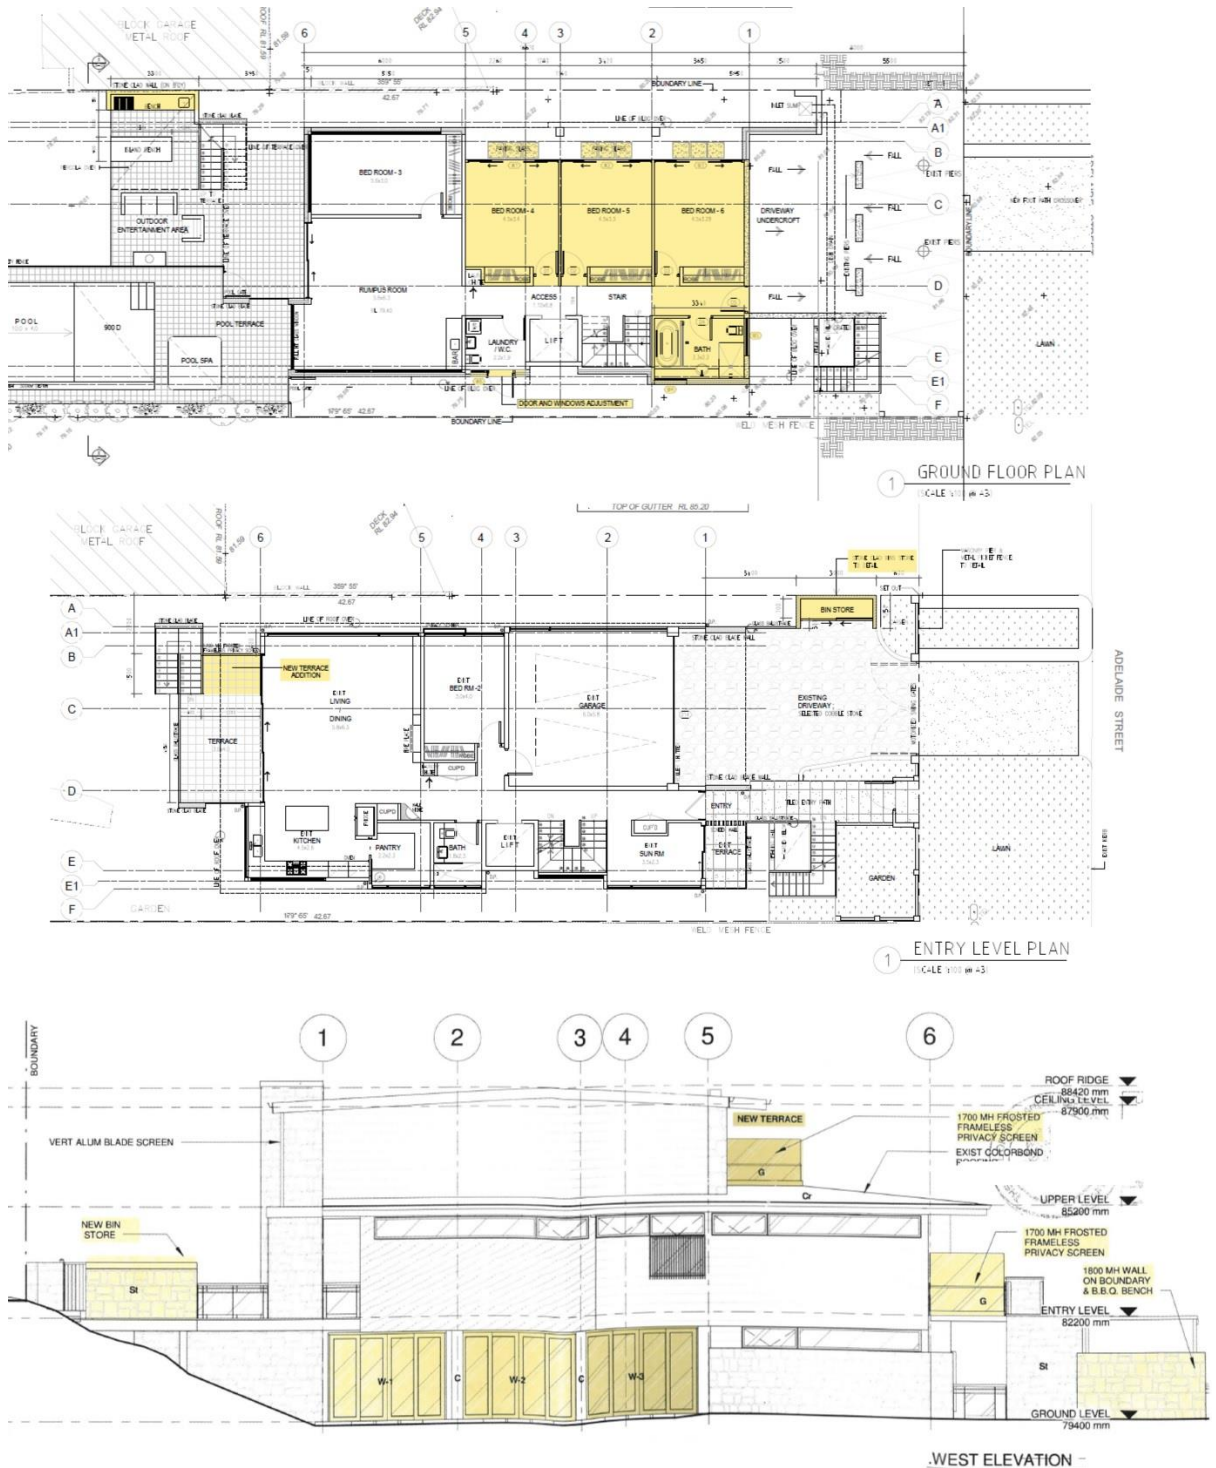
Proposed development as shown on the ground floor and entry level plans and the west elevation (subject to the sketch plans shown in Figures 3 and 4)
